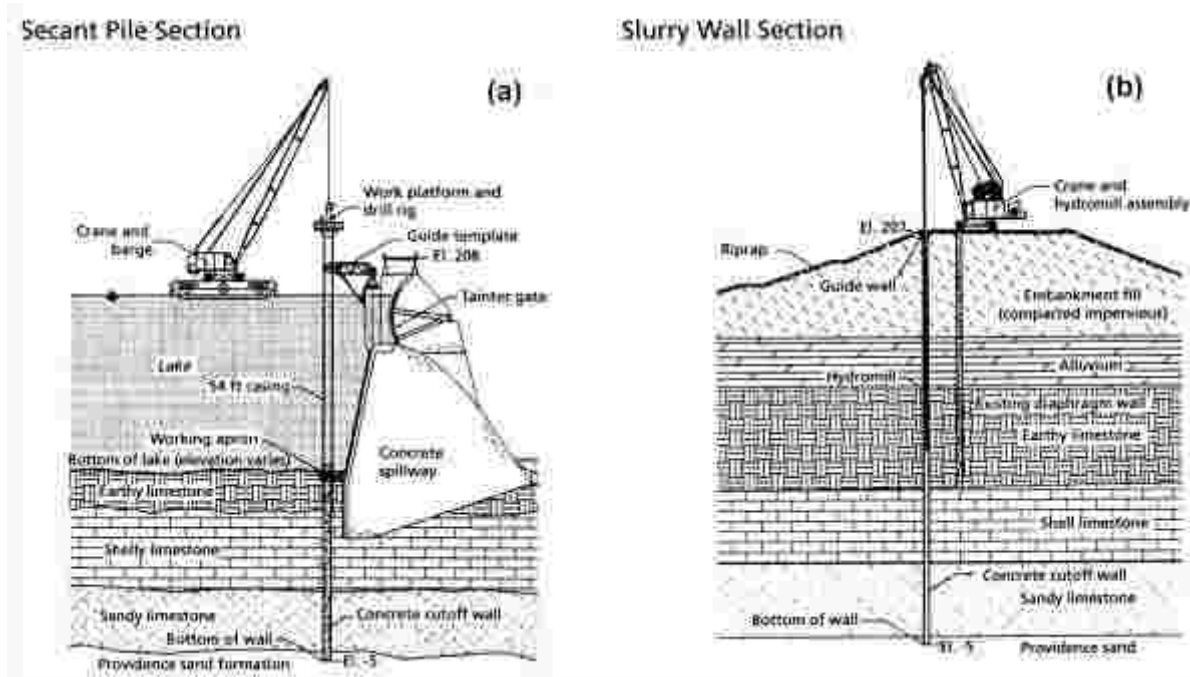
(a) Walter F. George dam: Installation of secant pile wall immediately upstream of the concrete section of the dam; (b) Installation of plastic concrete diaphragm wall in embankment sections
